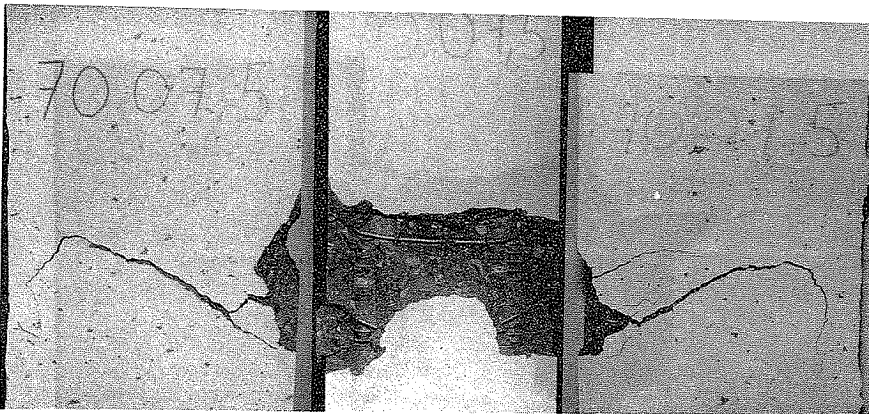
Failure of S.B.-specimen No. 70/07.5.
